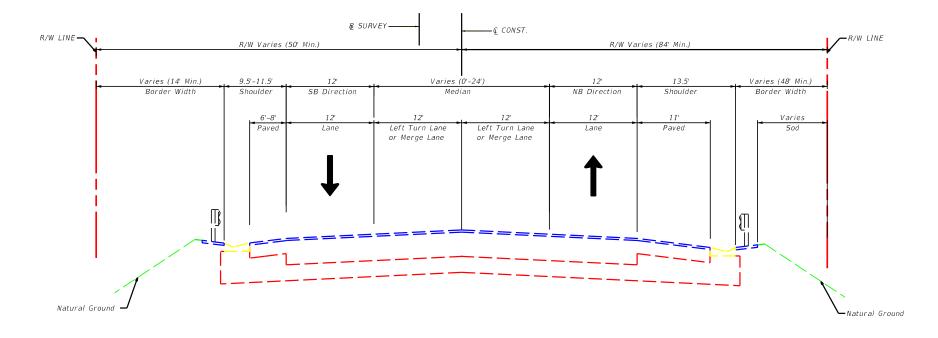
Existing Typical Section from Snake Creek Canal Bridge to W of Venetian Blvd
